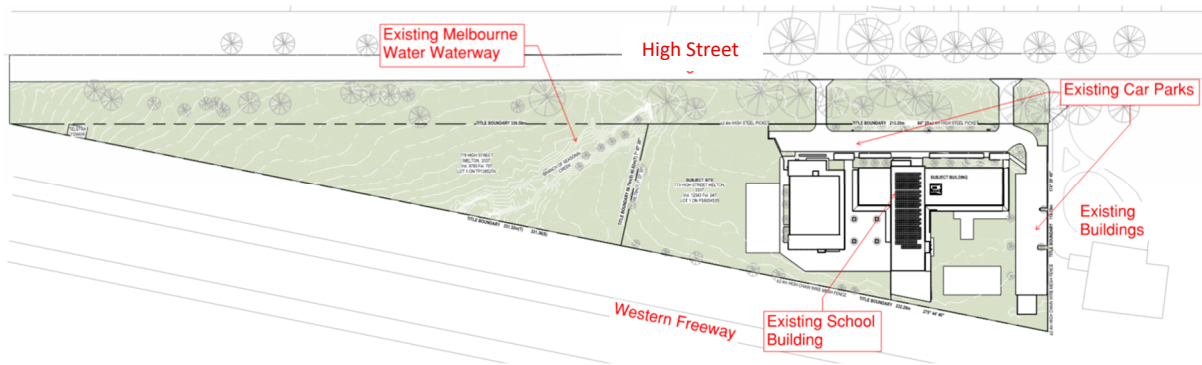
Subject Site Location and Features (Image courtesy of DETAIL X Studio).
